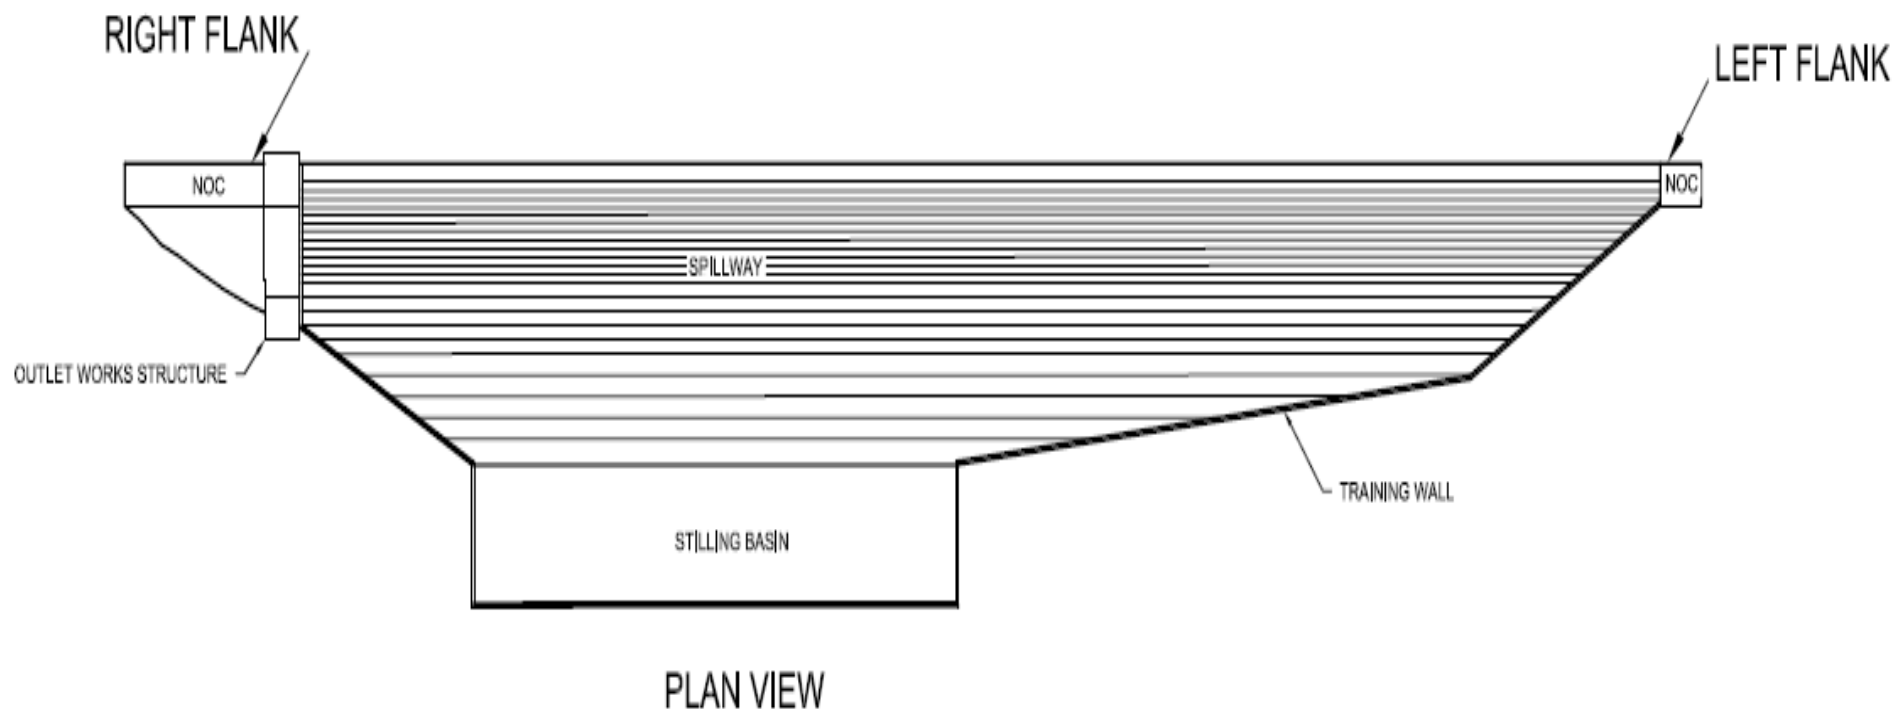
General Plan Layout of the Proposed RCC Dam
